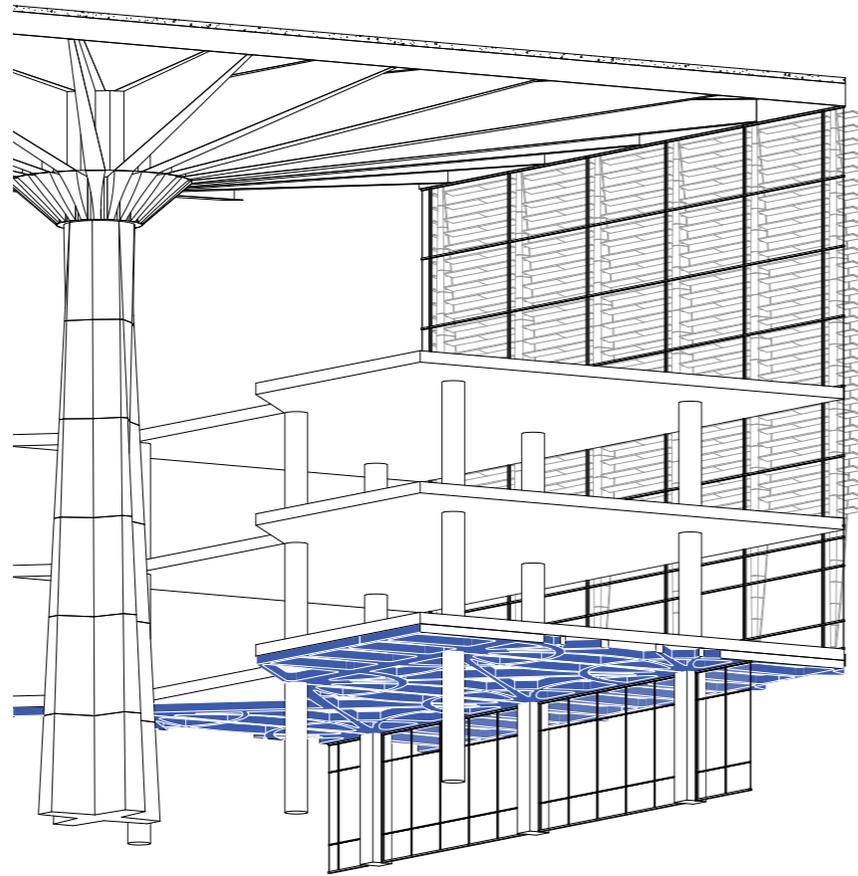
Scenario 3- Diagram of saving existing First floor slab.
